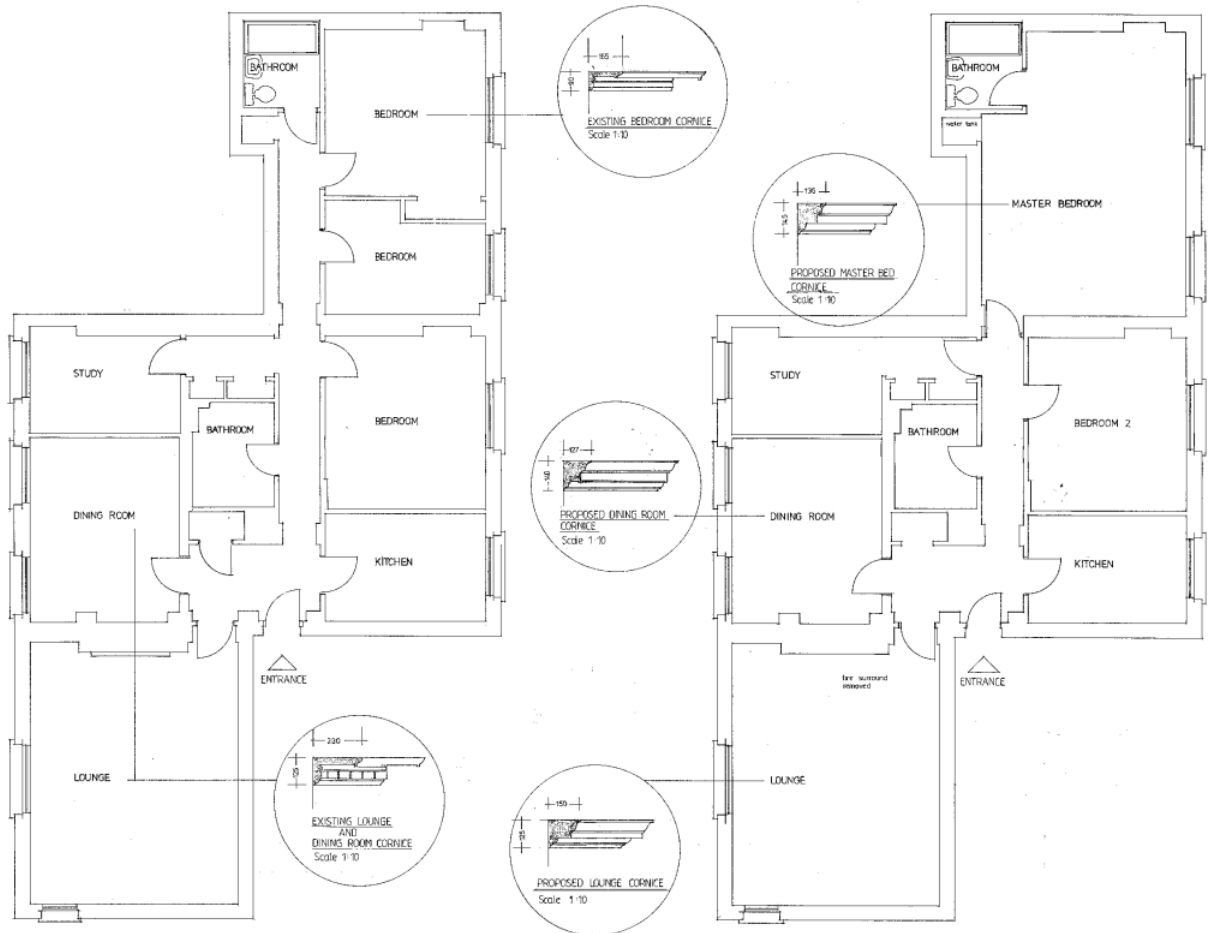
Existing and Proposed Plans of No. 33 in 2005.
